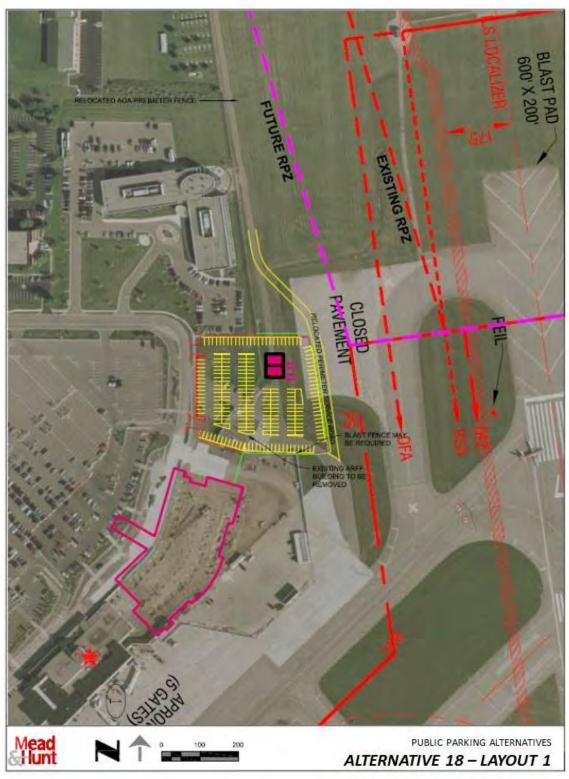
Alternative 18 with Rental Car QTA Facility – Layout 1
